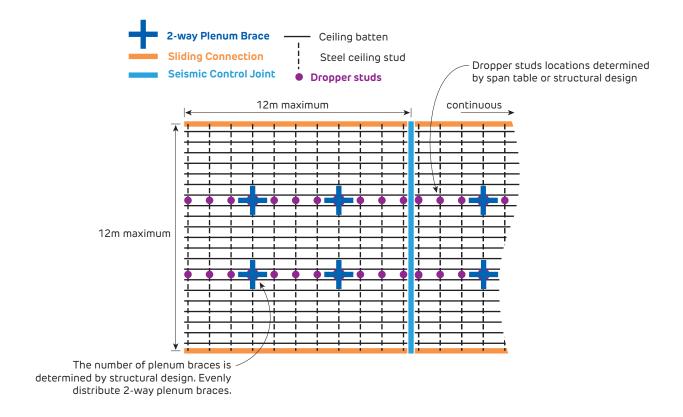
Stud Ceiling Type C2 - 2-way Plenum Braced Plan
